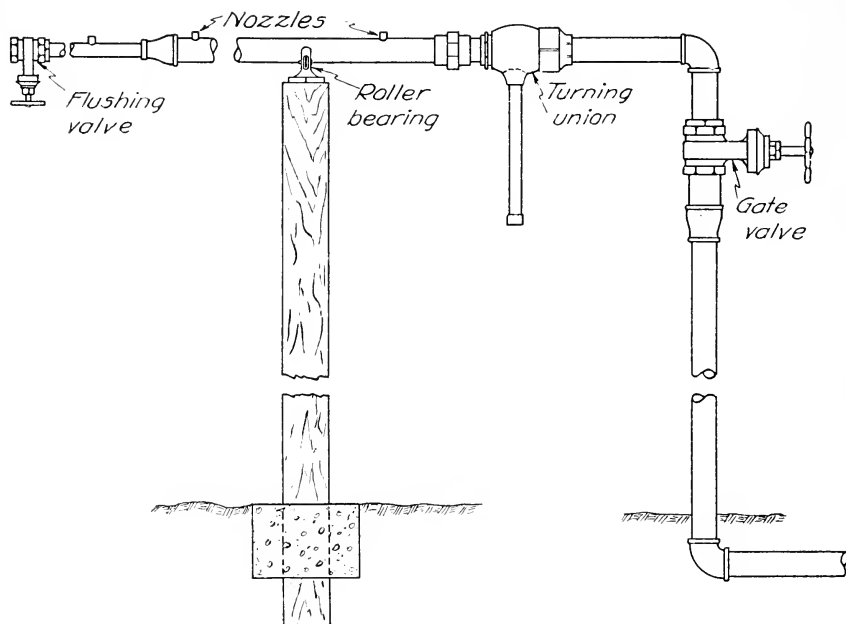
Detail of typical sprinkler line assembly. The special fittings required for the installation of overhead sprinkler lines can be secured only from manufacturers of sprinkling equipment.
